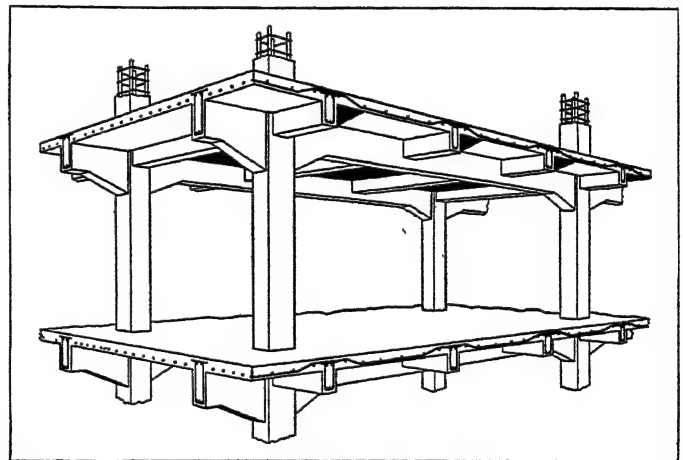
PERSPECTIVE SECTIONAL VIEW OF REINFORCED CONCRETE STRUCTURE, SHOWING COLUMNS, BEAMS AND FLOOR SLABS
